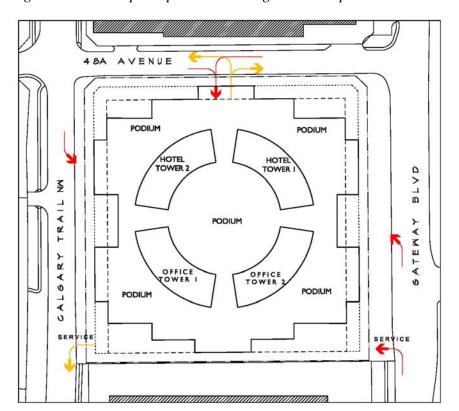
Conceptual plan illustrating the development with access and egress points.
